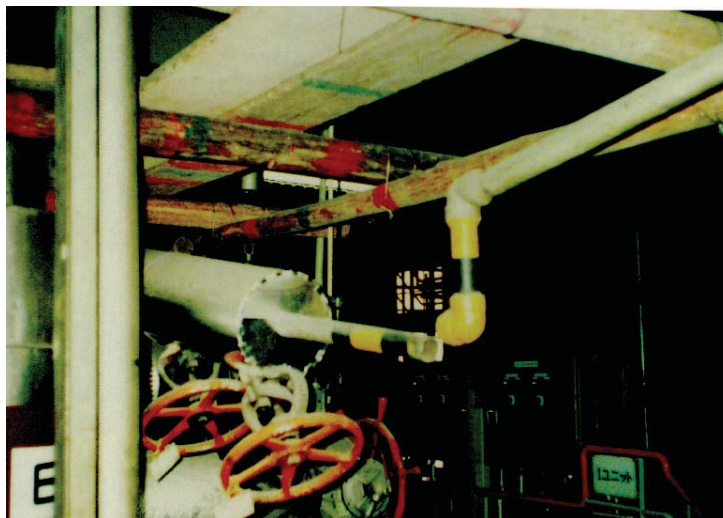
Instance of Inertial-Induced Failure of Threaded Elbow
